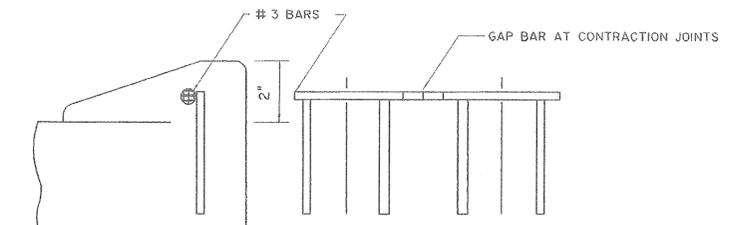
DETAIL SHOWING JOINTS IN CONCRETE CURB AND GUTTER
